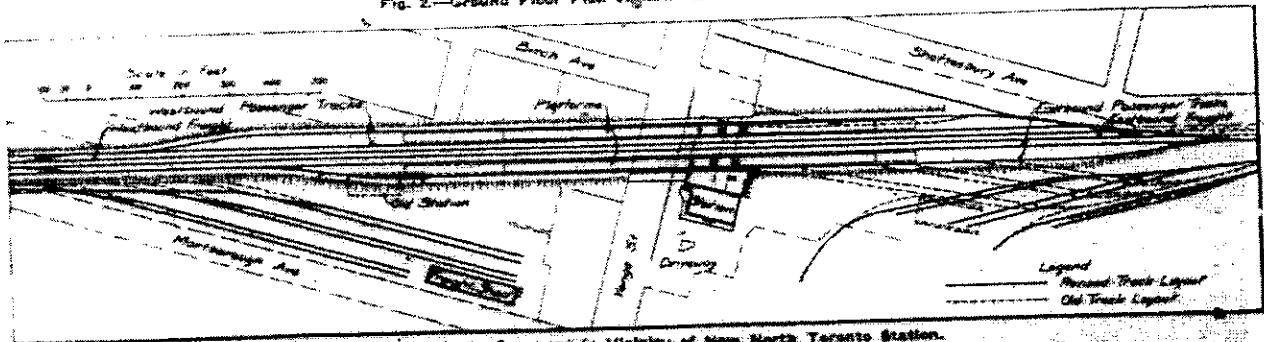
Track Arrangement in Vicinity of New North Toronto Station.
